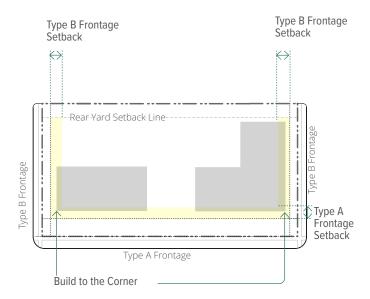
Build to the Corner and Frontage Setbacks
